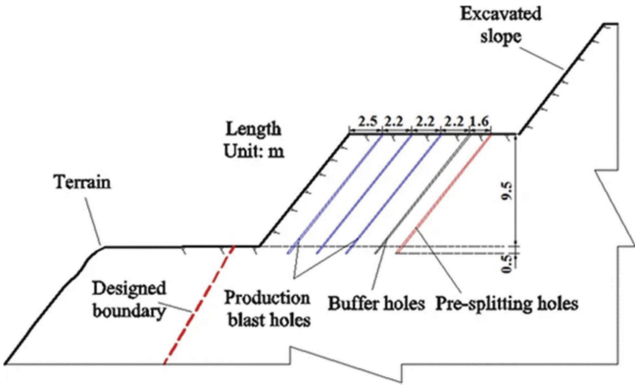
Example of excavation of a large-scale rock slope (Yan et al. 2016).
